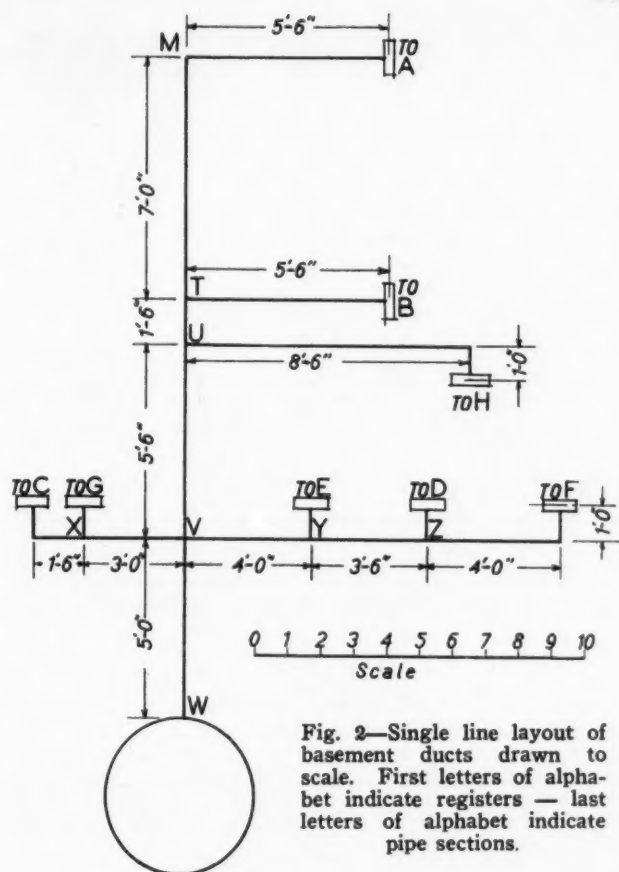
Single line layout of basement ducts drawn to scale. First letters of alphabet indicate registers — last letters of alphabet indicate pipe sections.
